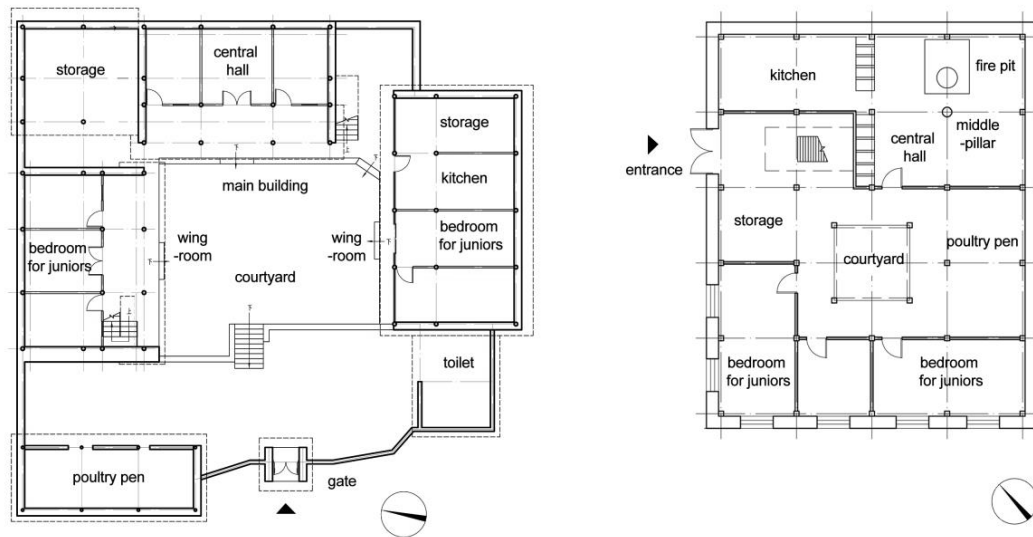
The Plans of Typical Traditional Rural Buildings (Left, a Dwelling of Bai in Yunnan; Right, a Tibetan Dwelling) Drawing by Author.
